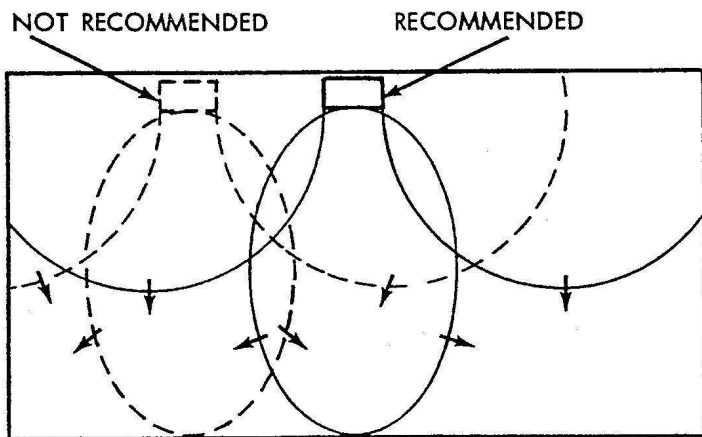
CENTERED PLACEMENT - LONG WALL
